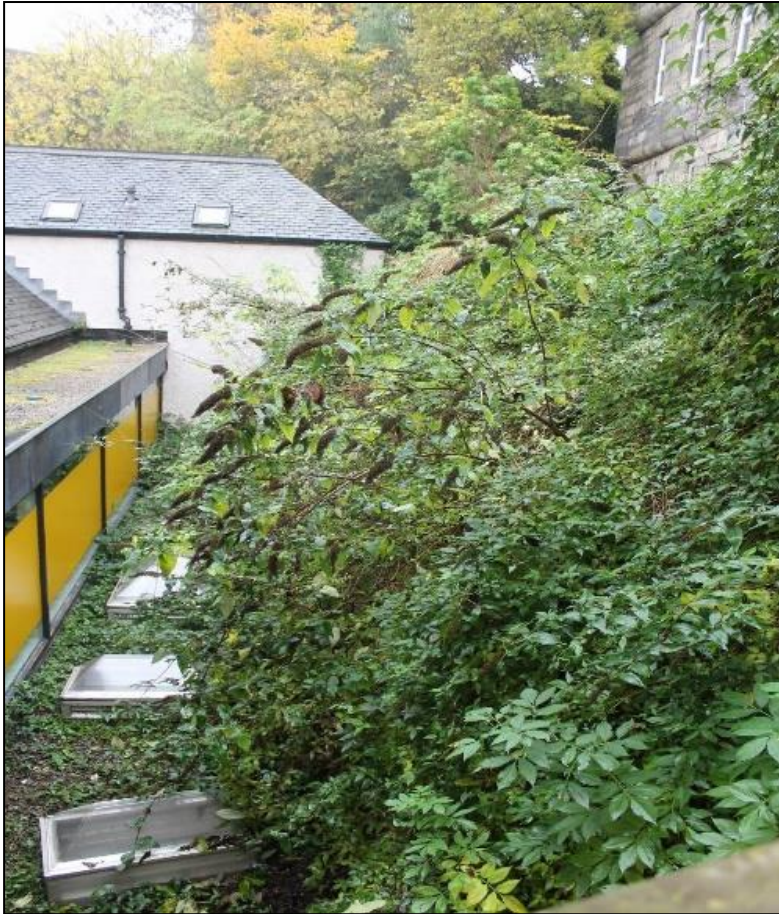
View over the top of the basement rooms and joining onto the present retaining wall.
